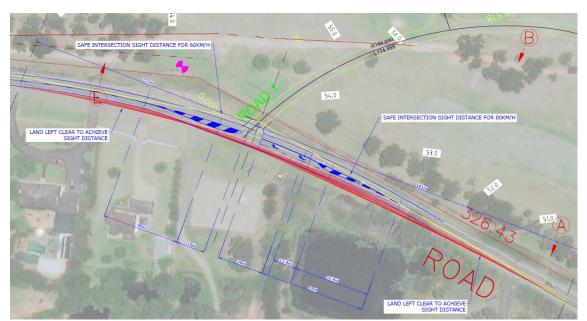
Concept Design of Access Road - Channelised T-junction - Short Lane Type CHR(s)
